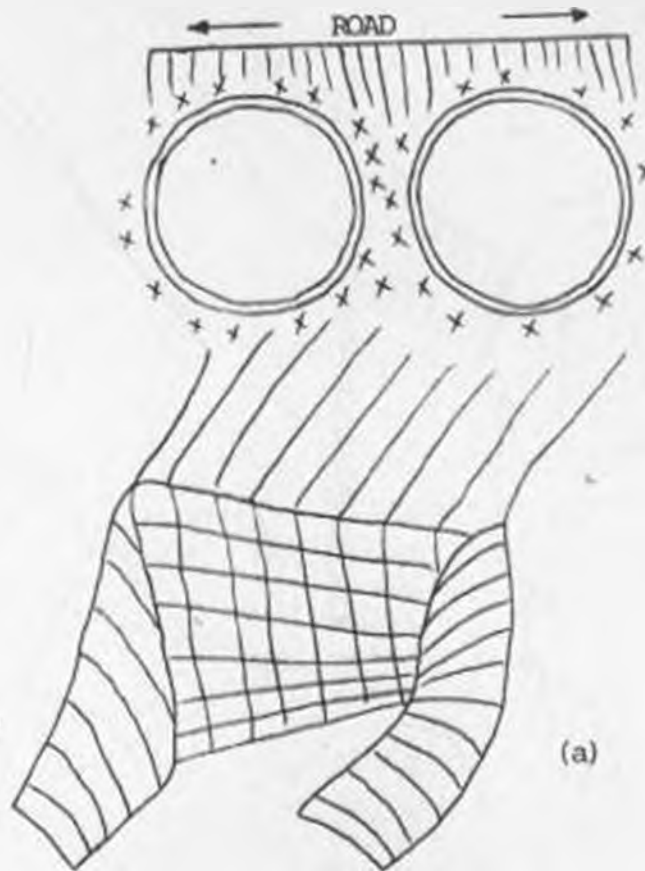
(a). 0.9 m. double pipe concrete cross culvert, with gabion at the outlet.
